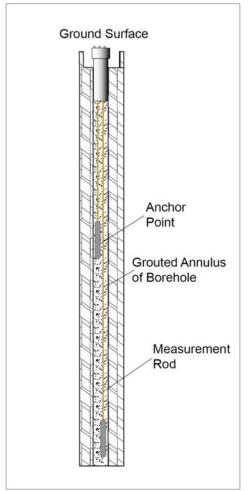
Fixed Embankment MPBX with Grouted Anchors
